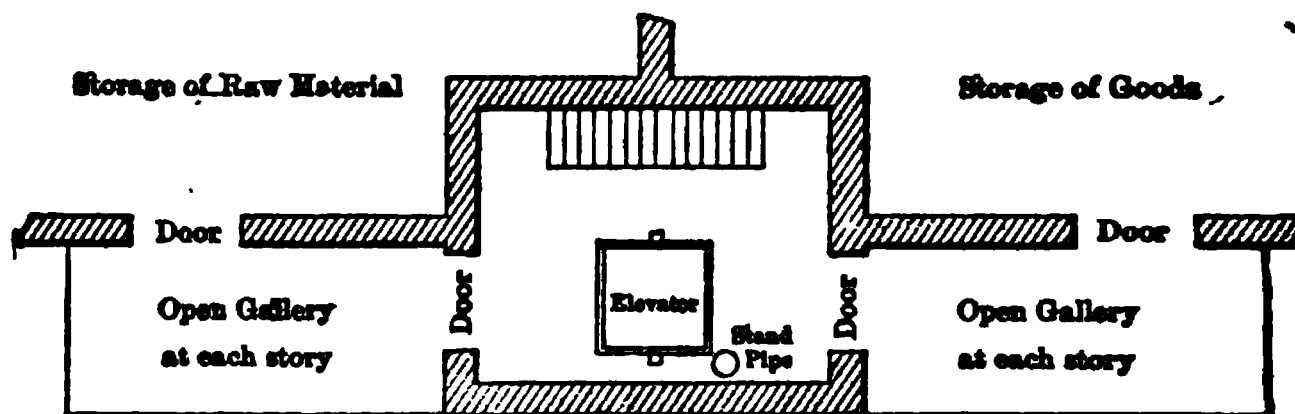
Stairway-tower and Galleries at Side of Storehouse
